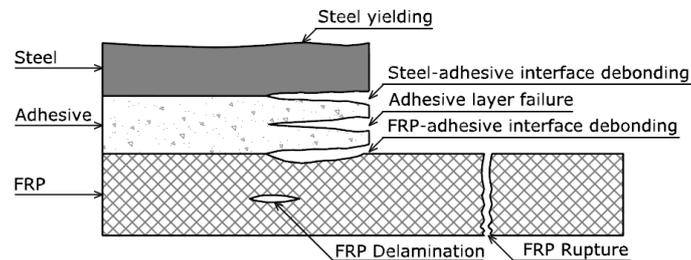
Failure modes for FRP-to-steel adhesively bonded joints.
